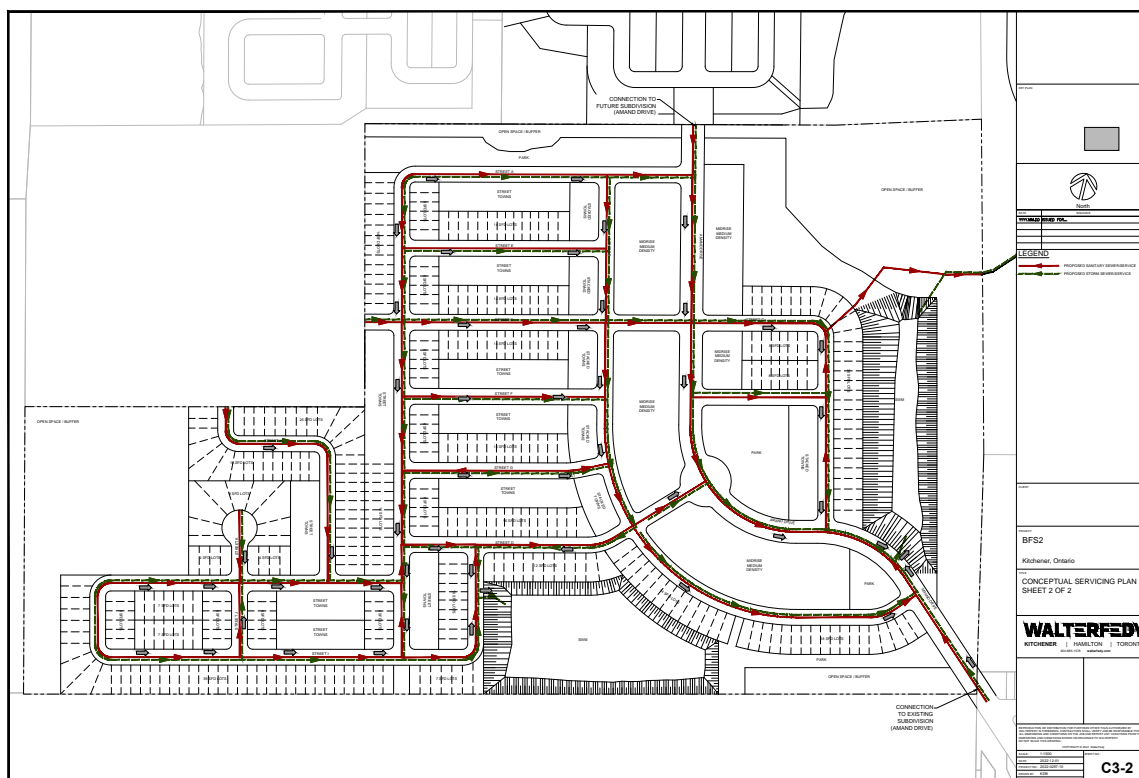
WalterFedy - Conceptual Servicing Plan Utilizing Existing Storm and Sanitary Outlets
